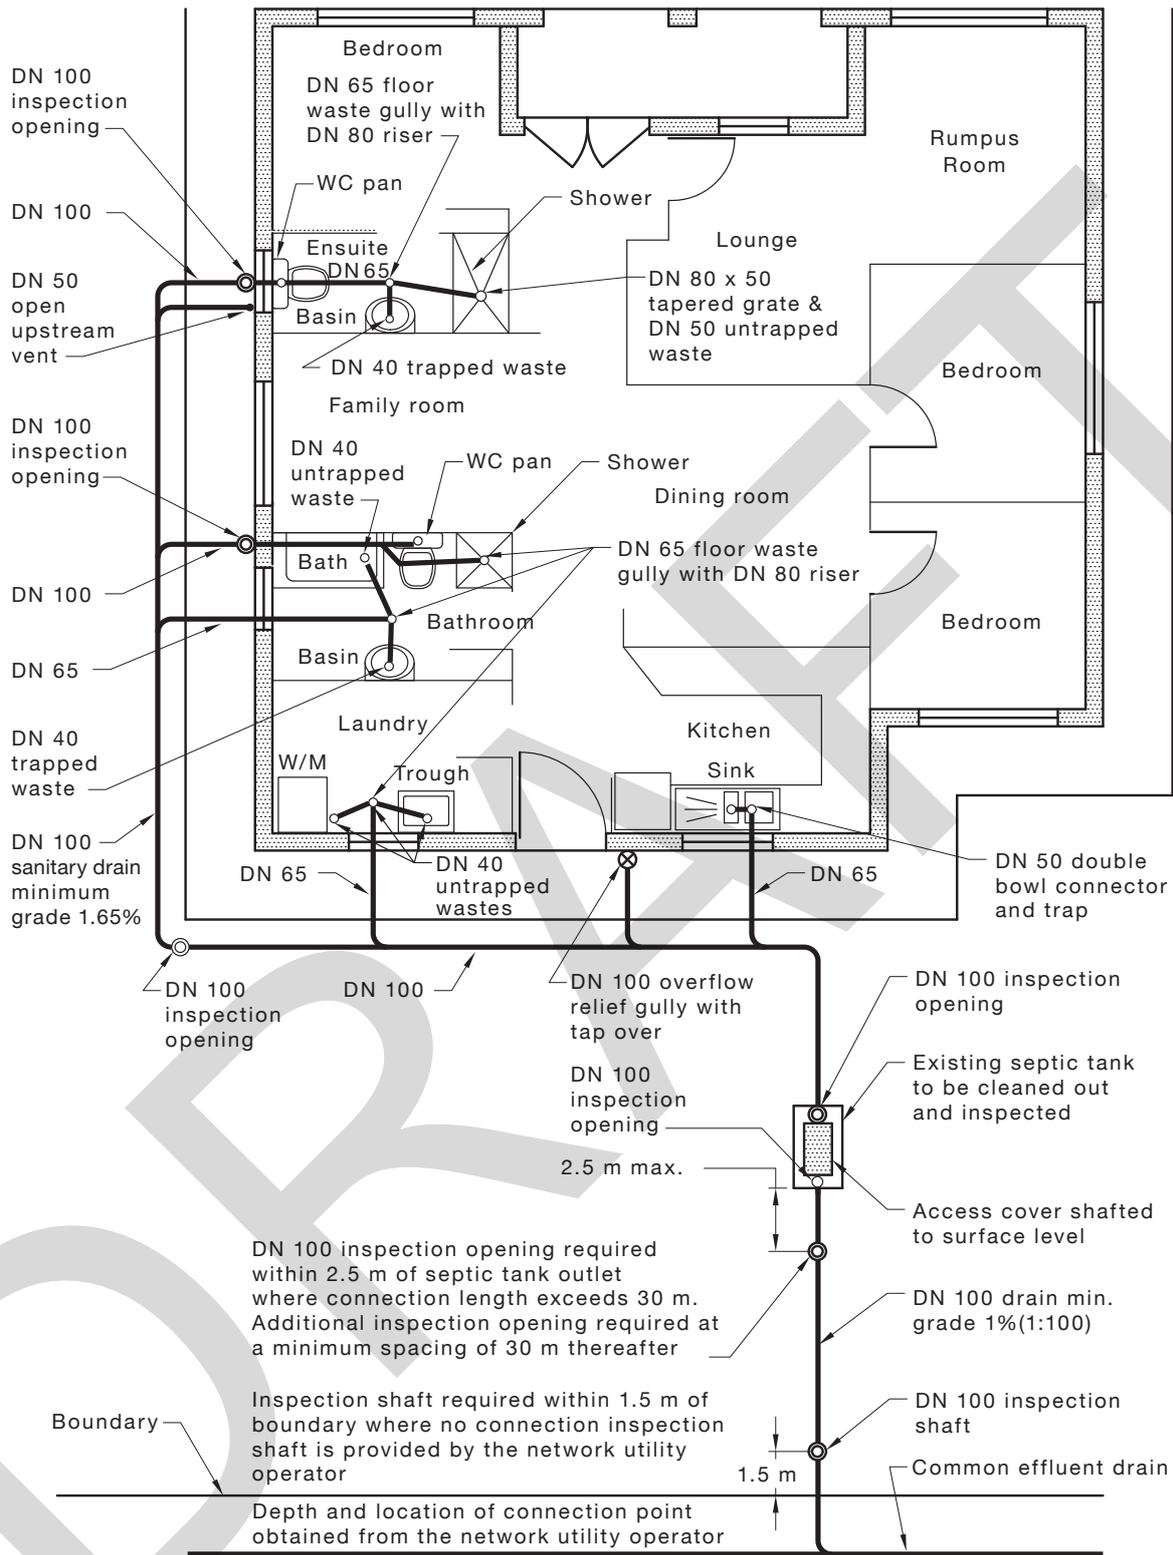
(B) TYPICAL CONNECTION OF SEPTIC TANK TO COMMON EFFLUENT DRAIN (EXISTING ALL-WASTE SEPTIC TANK INSTALLATION ONLY)
